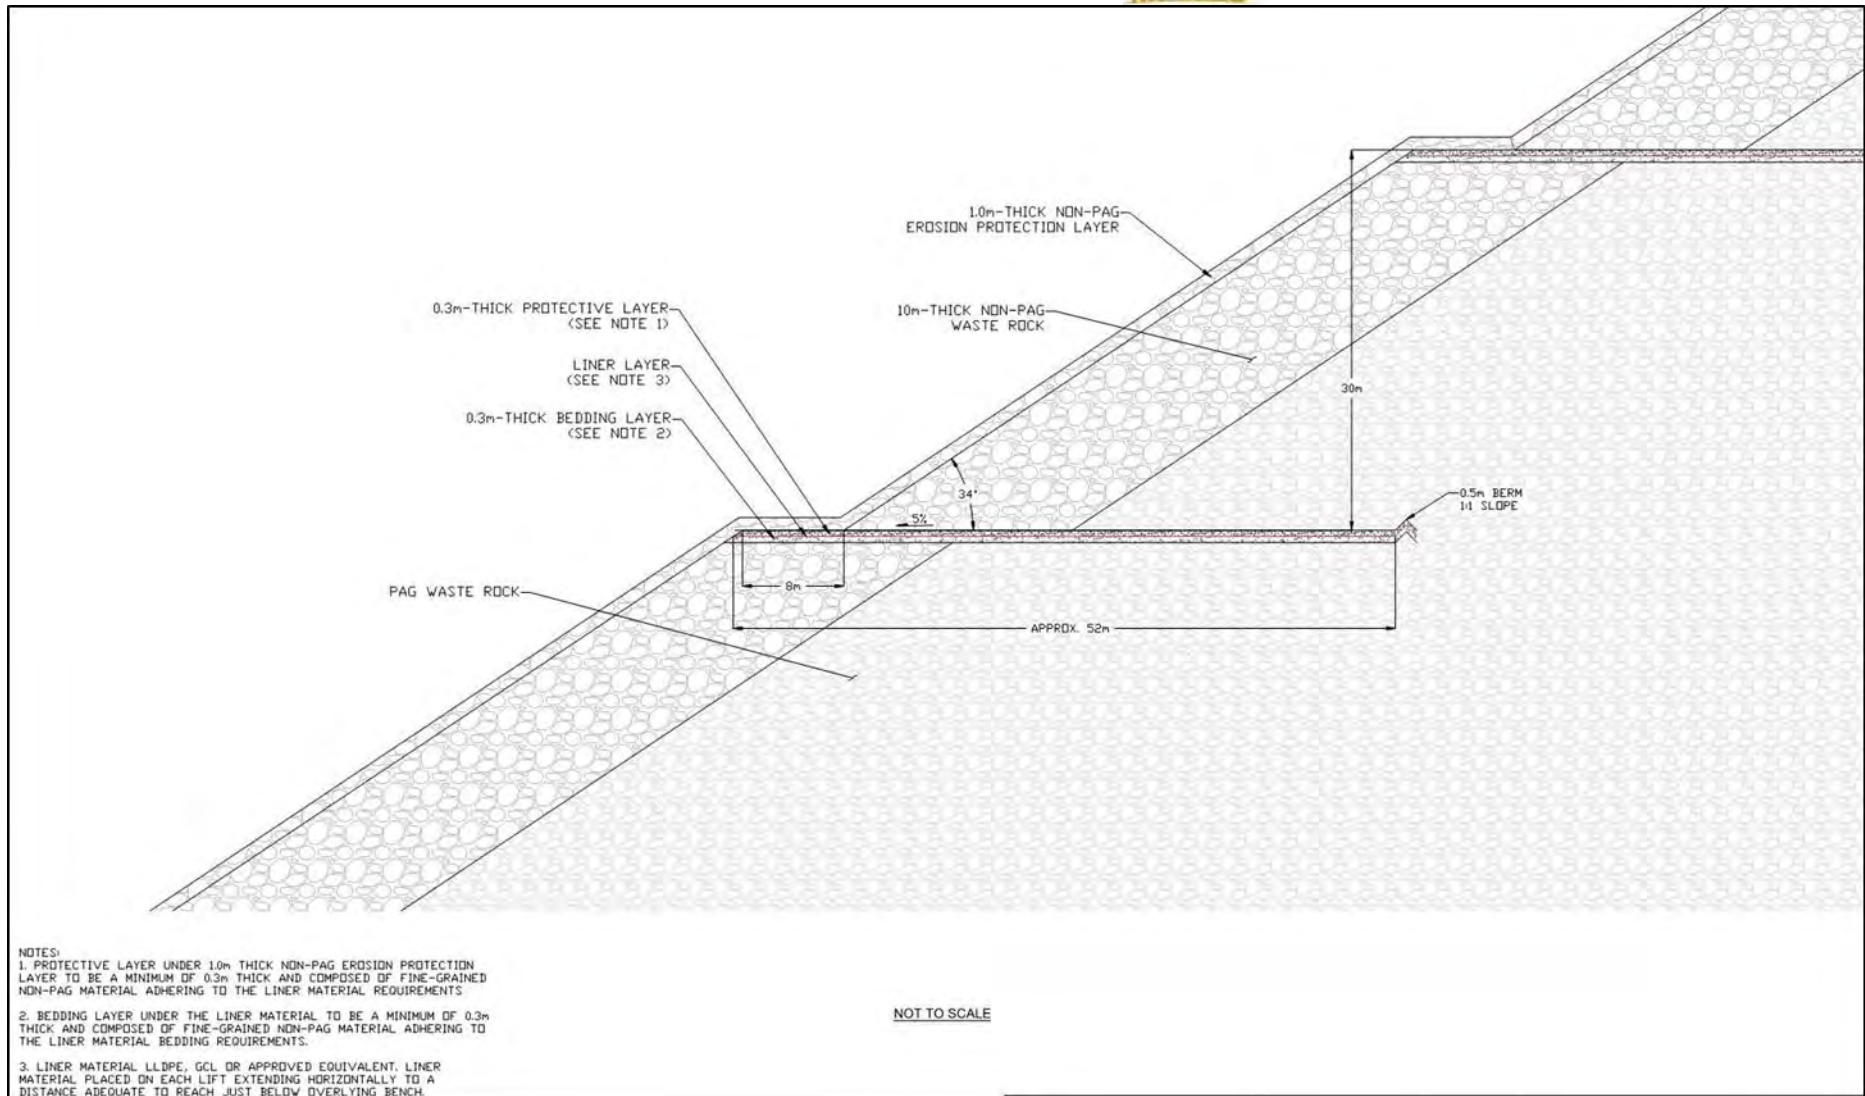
WRD Typical Preferred Cover System Cross-section (Tetra Tech, 2020)
